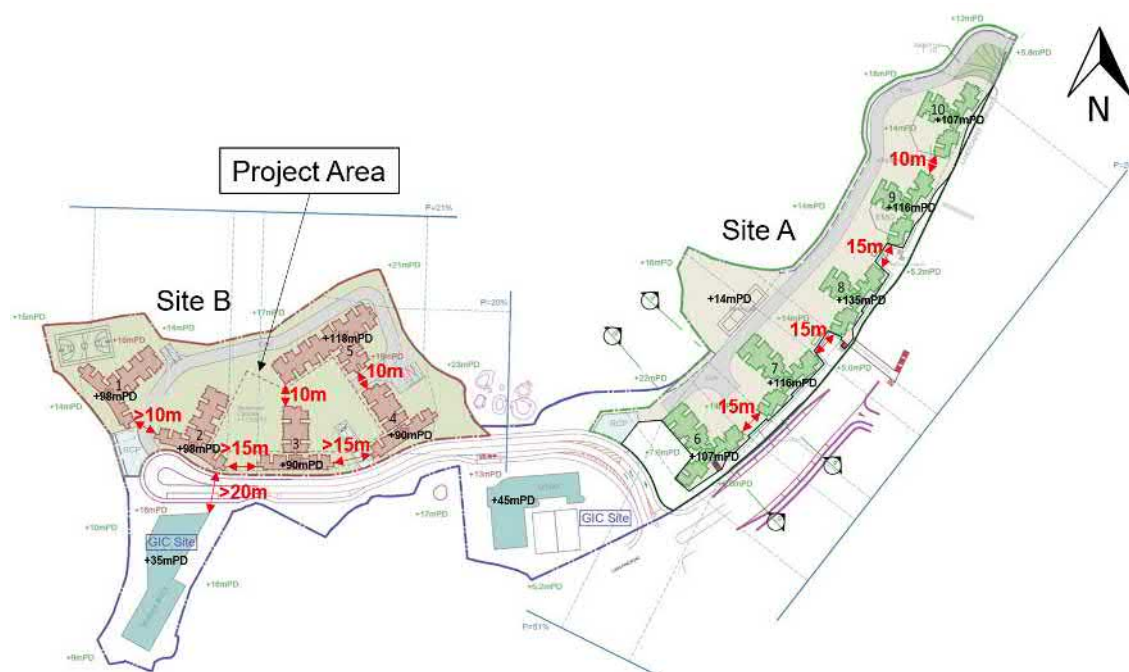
Indicative Plan of Baseline Scheme (Master Layout) Extracted from Wang Chau AVA-EE (2014)
